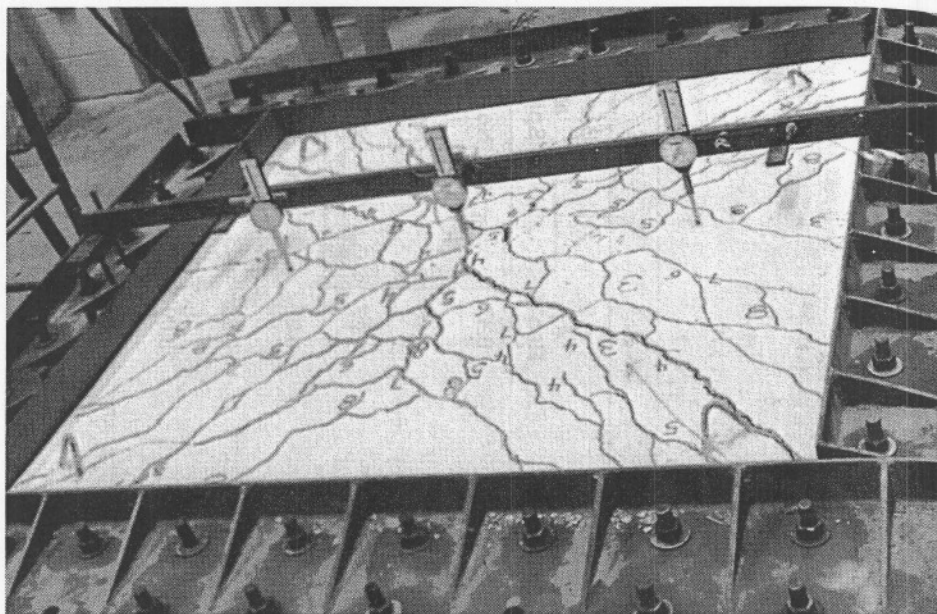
Flexural cracking in restrained one-panel reinforced concrete slab. (Tests by Nawy et al.)
